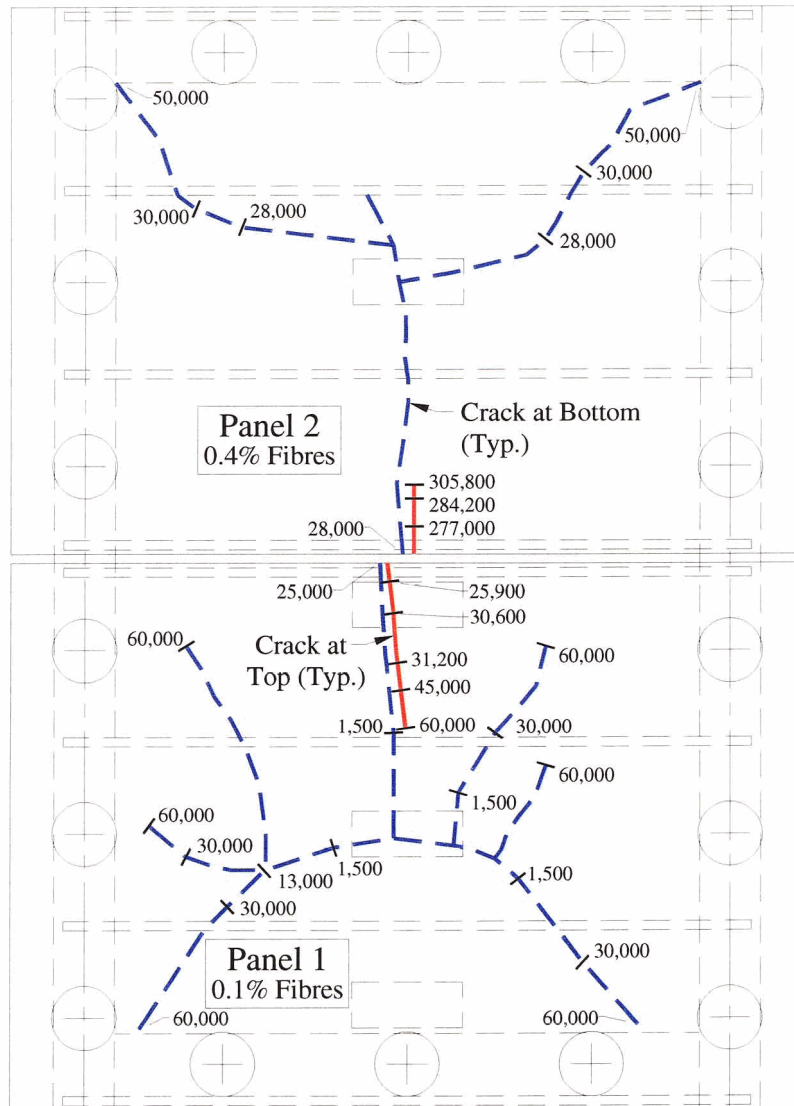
Crack Pattern Developed under Central Pulsating Loads
